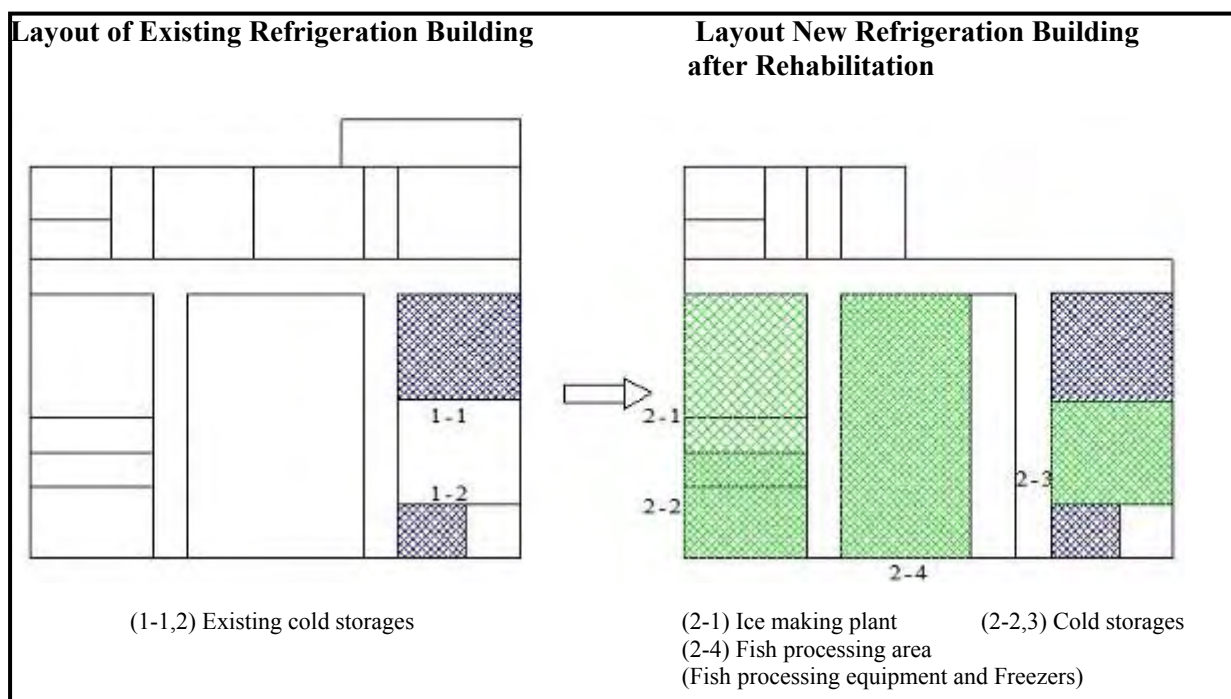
Existing Layout and Proposed Design of Refrigeration Facilities (Iloilo)
